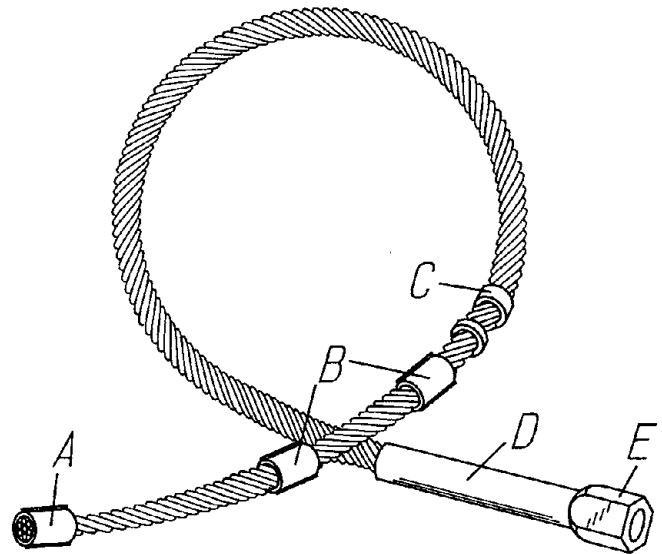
Specific components of a resin-grouted cable bolt. *A*, swaged-on fitting to tie all cable strands together; *B*, wedged-on buttons for additional anchorages; *C*, short button to hold plastic seal in place; *D*, cable stiffener rod; and *E*, installation head or cable nut.
